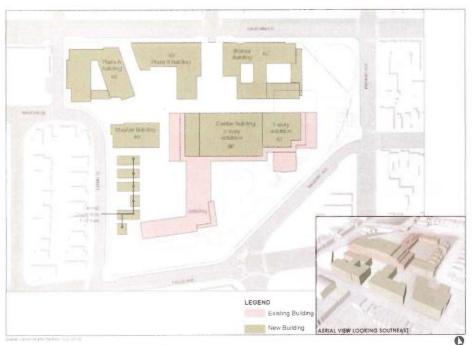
ALTERNATIVE B: FULL PRESERVATION - OFFICE ALTERNATIVE SITE PLAN
